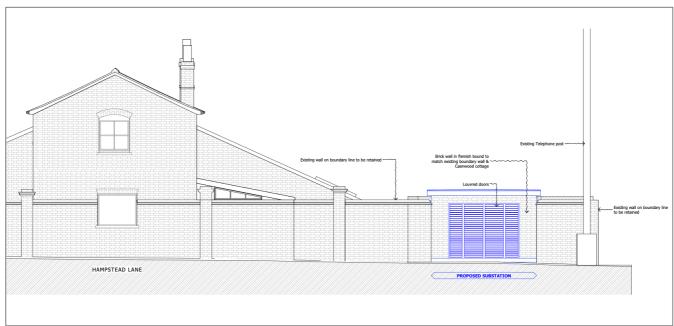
Approved plan showing proposed substation location in relation to Caenwood Cottage
